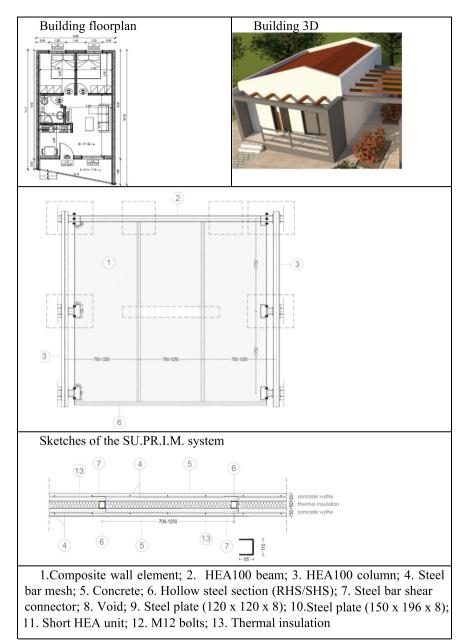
Floorplan, 3D image, structural system and wall composition of the SUPRIM case study
